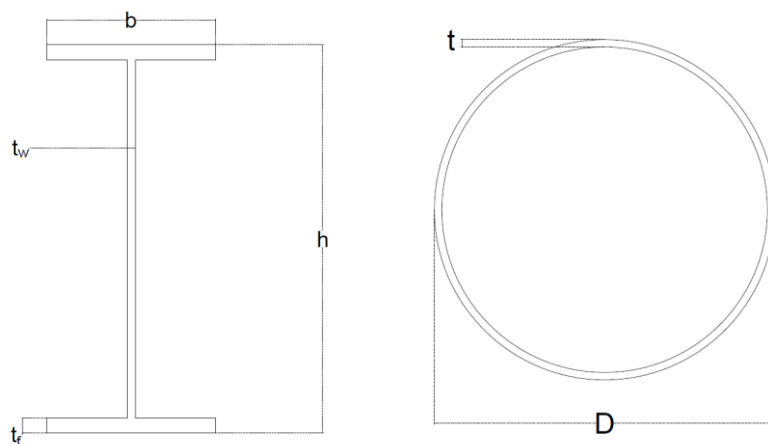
Wide flange (left) and tubular (right) member sections
